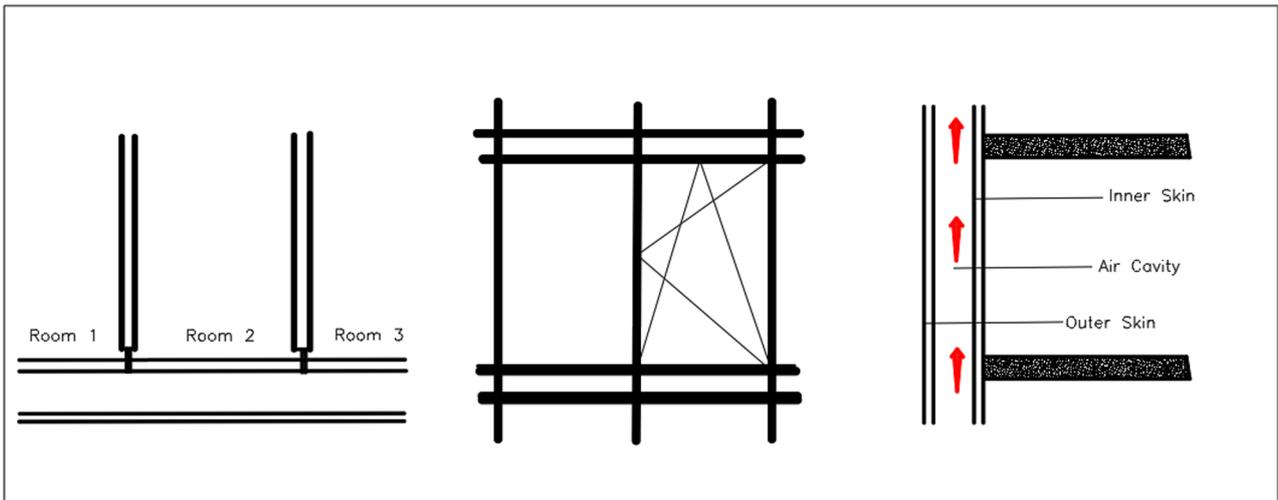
Floor, elevation and section of Multi story (drawn by author).
